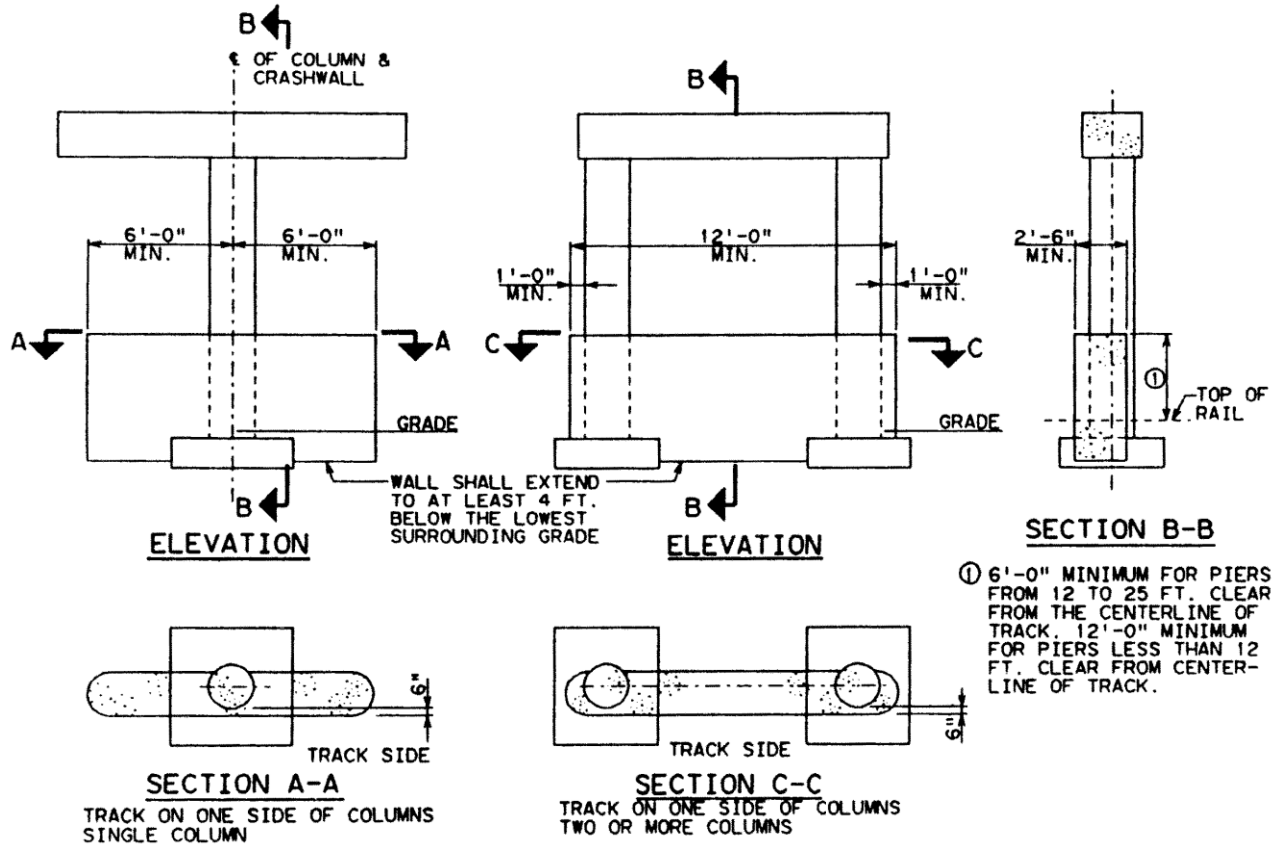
Pier Protection: Minimum Crash Wall Requirements (Not To Scale)
